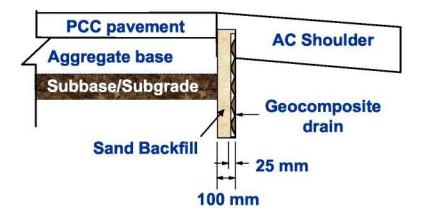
Typical PCC pavement with geocomposite edgedrains (ERES, 1999).
